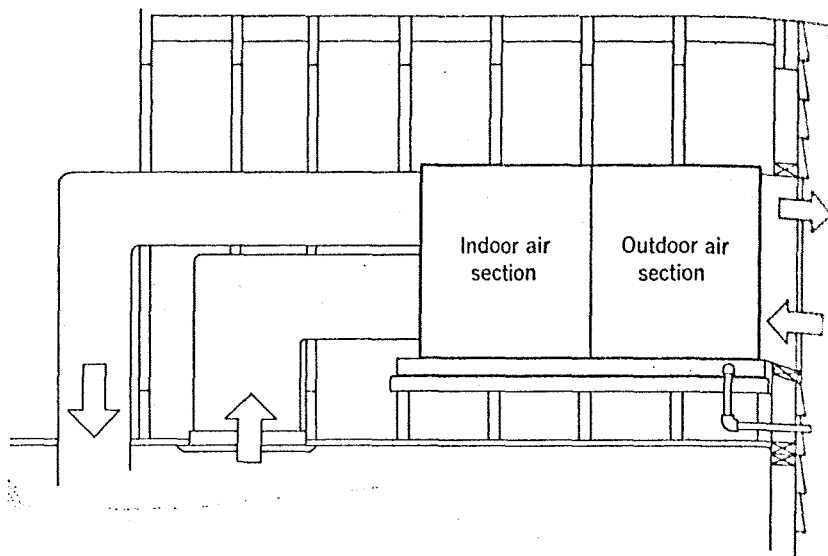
Horizontal, single package unit mounted in attic, flush to outside wall.
